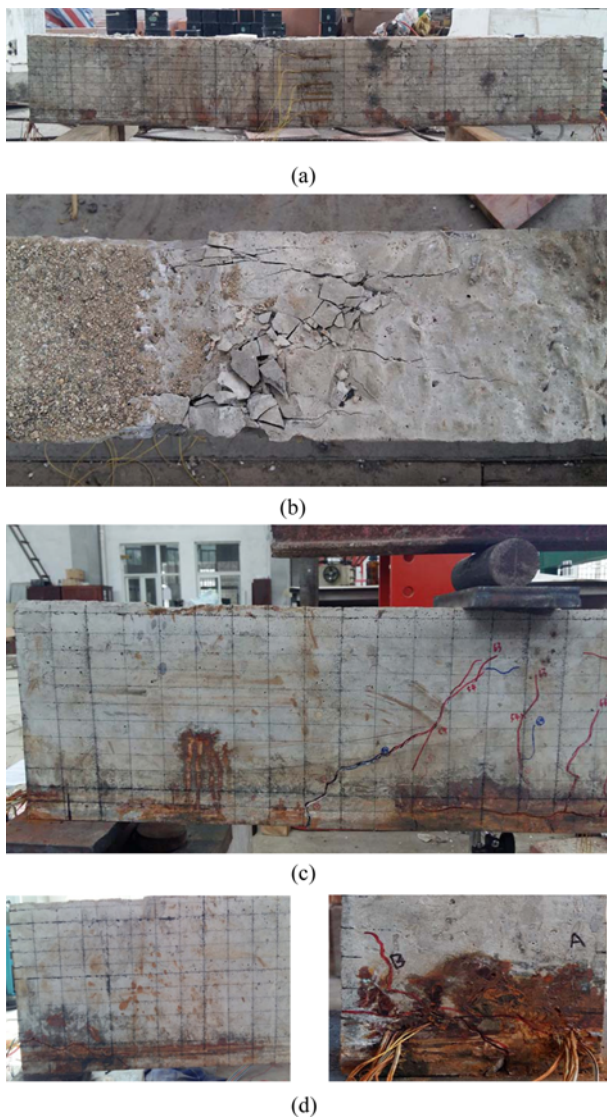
Photos of Different Failure Modes: (a) Concrete Crushing of Beam A0; (b) Vertical View of Beam A0, (c) Shear Failure of Beam A12, (d) Bond Failure of Beam A18
